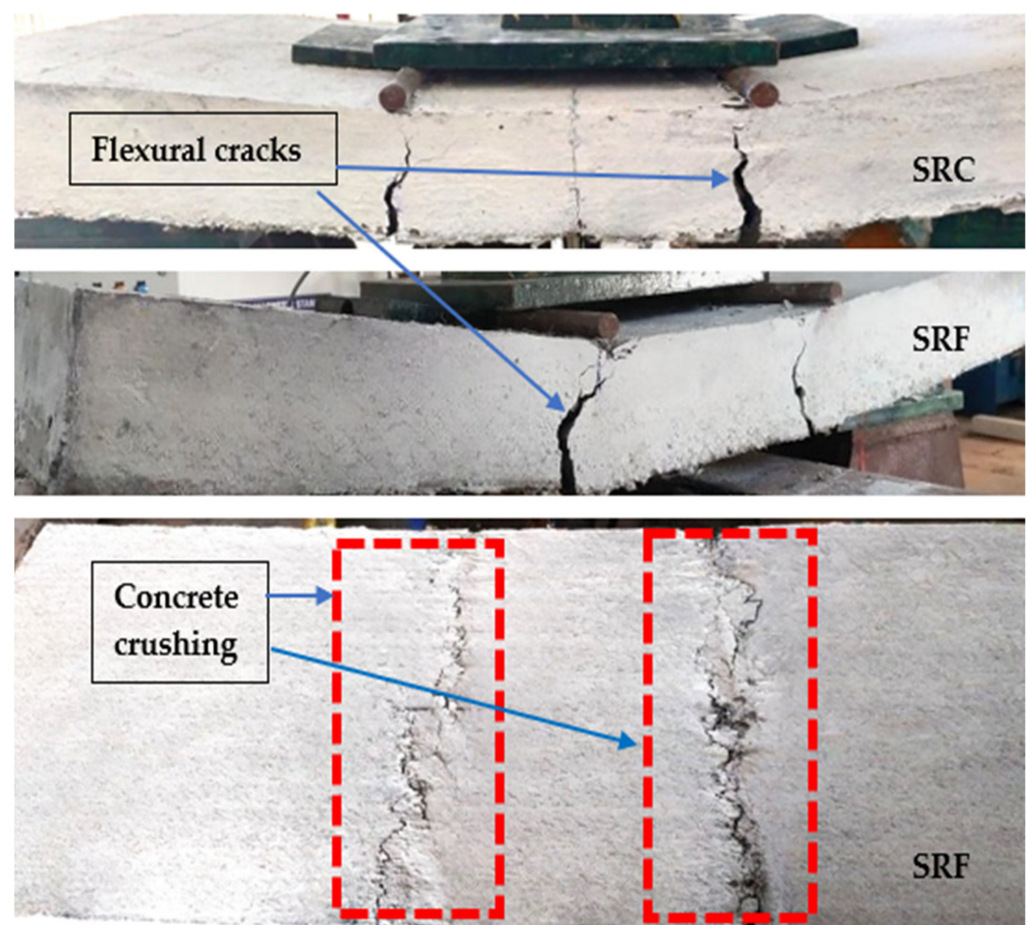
Crack propagation and failure mode of Mode-I slab specimens.
